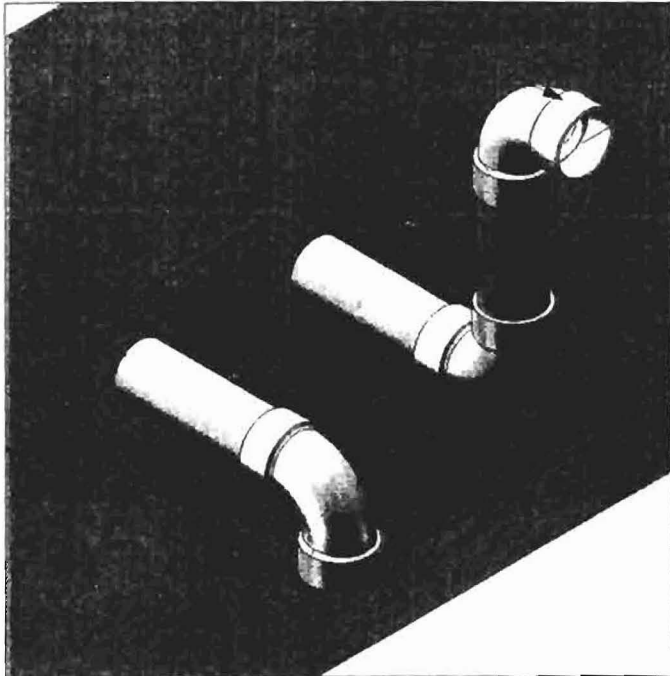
Direct Vent - Sidewall Termination of Vent and Combustion Air Piping
